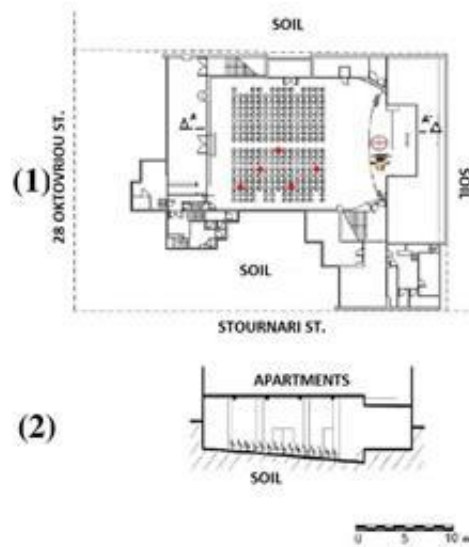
Alfa Idea Theatre. 1: Theatre plan, 2: Long section,
